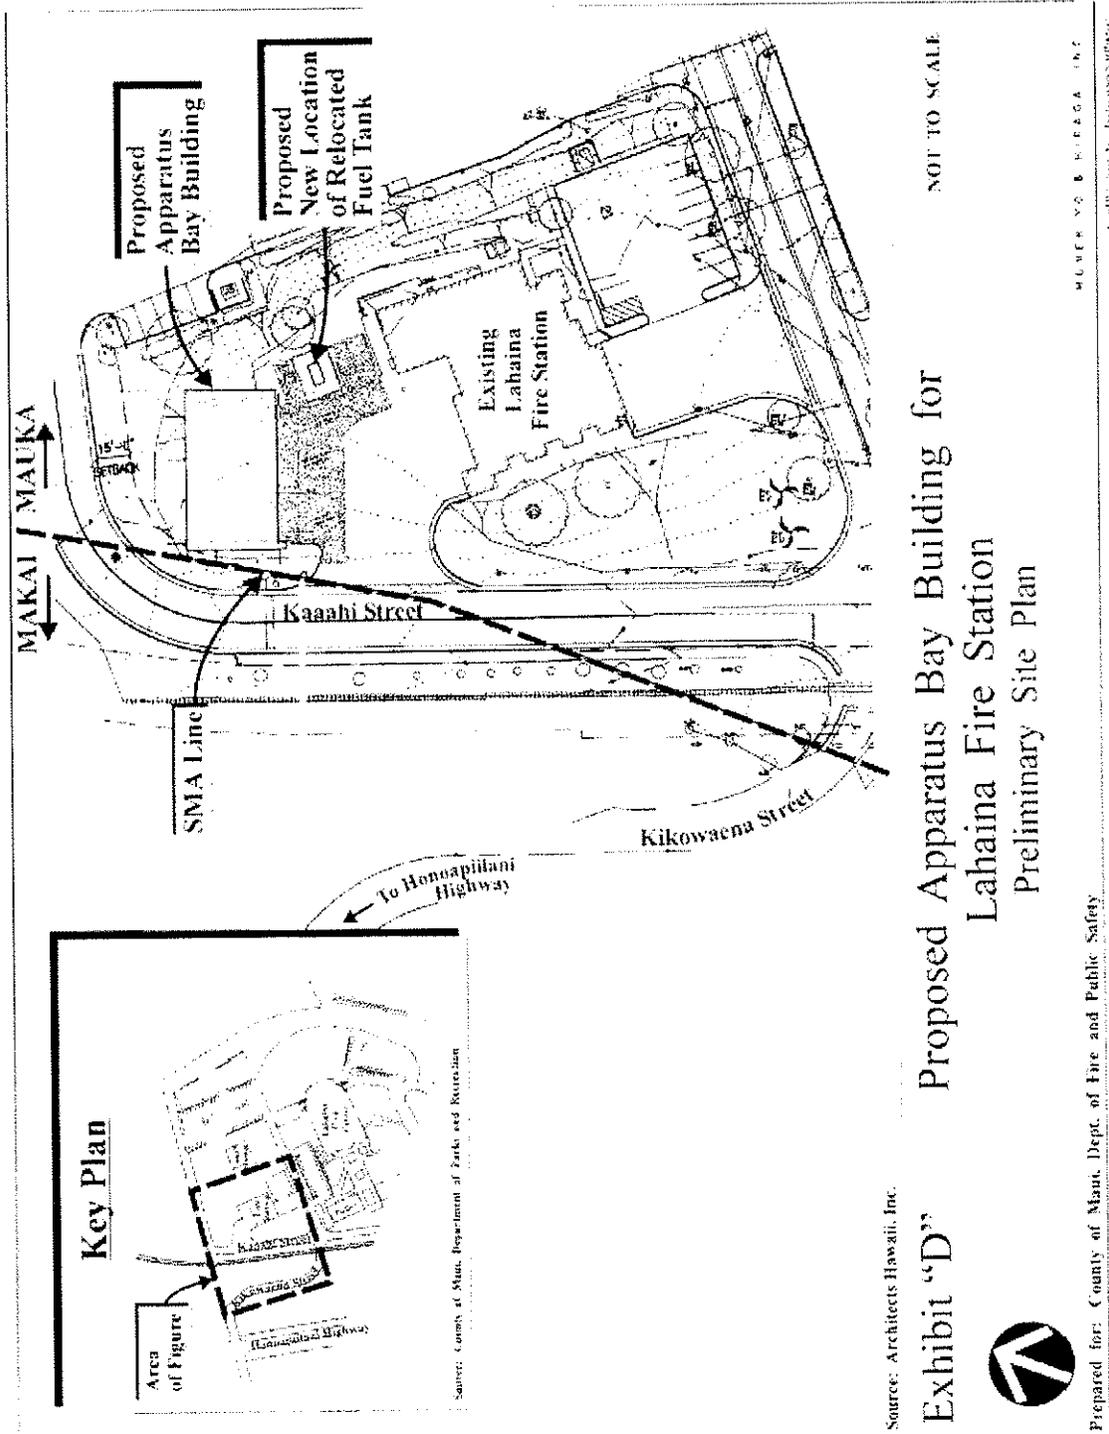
Plan view of the proposed Apparatus Bay Building location, Lahaina Fire Station.
